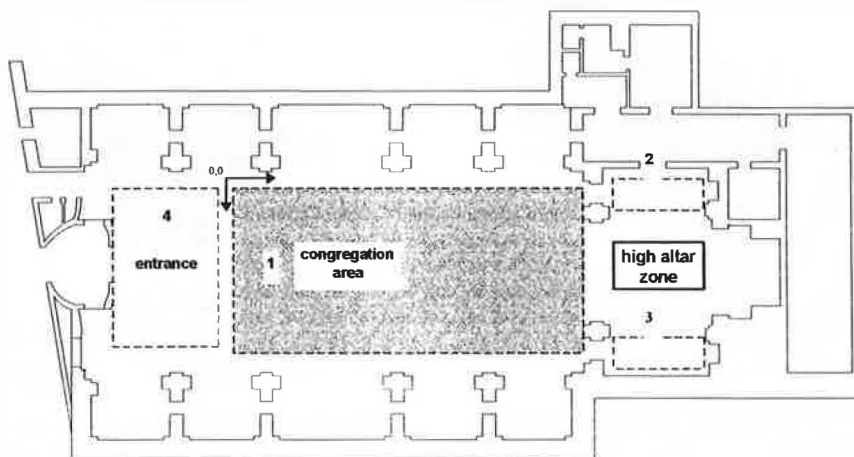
Planimetry of the Church; 1, 2, 3 and 4 are representative of heated zones
